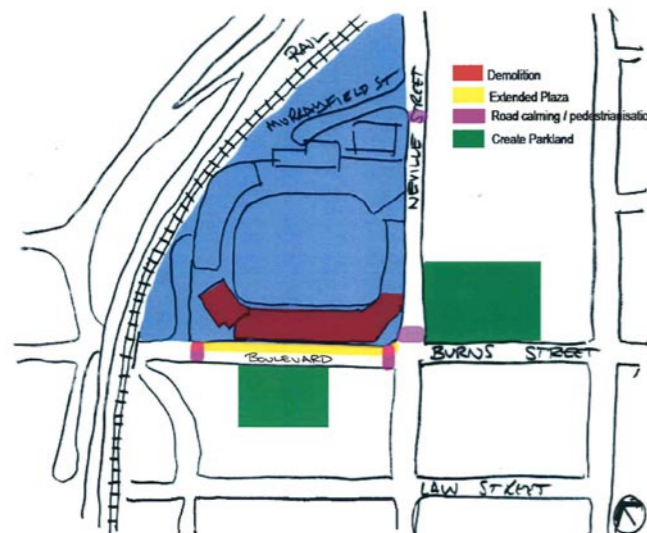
Site Plan – Demolition and Pedestrianisation
